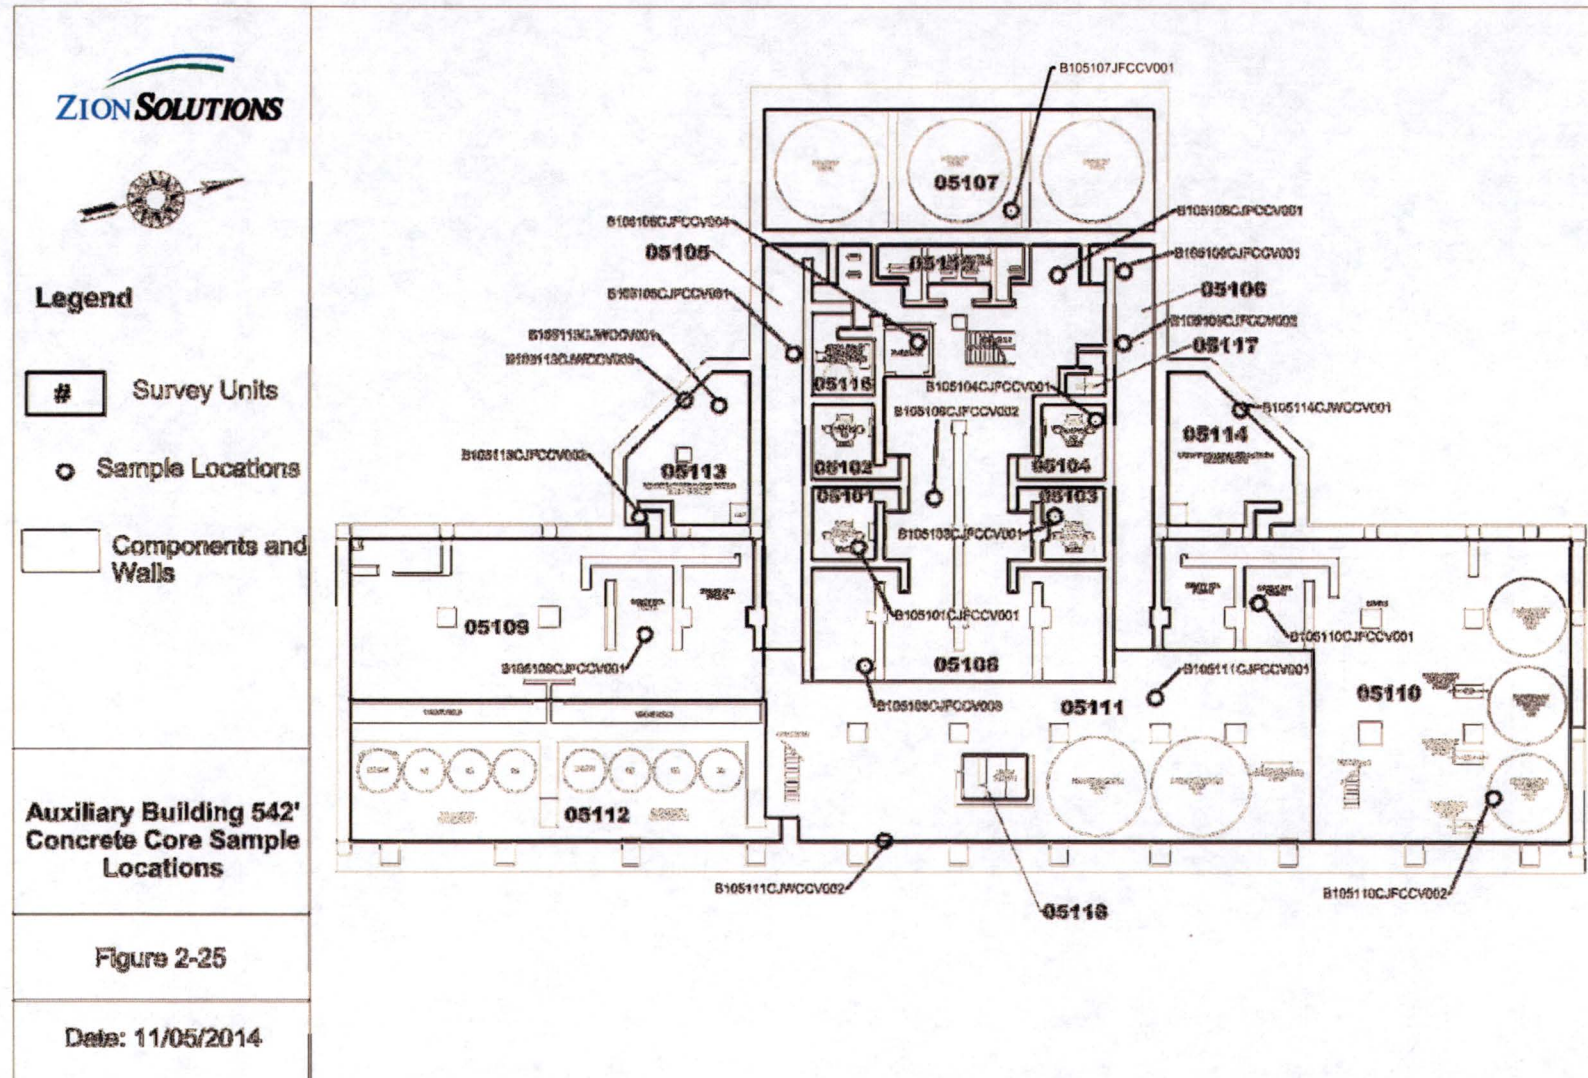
Auxiliary Building 542 foot el. Concrete Core Sample Locations
